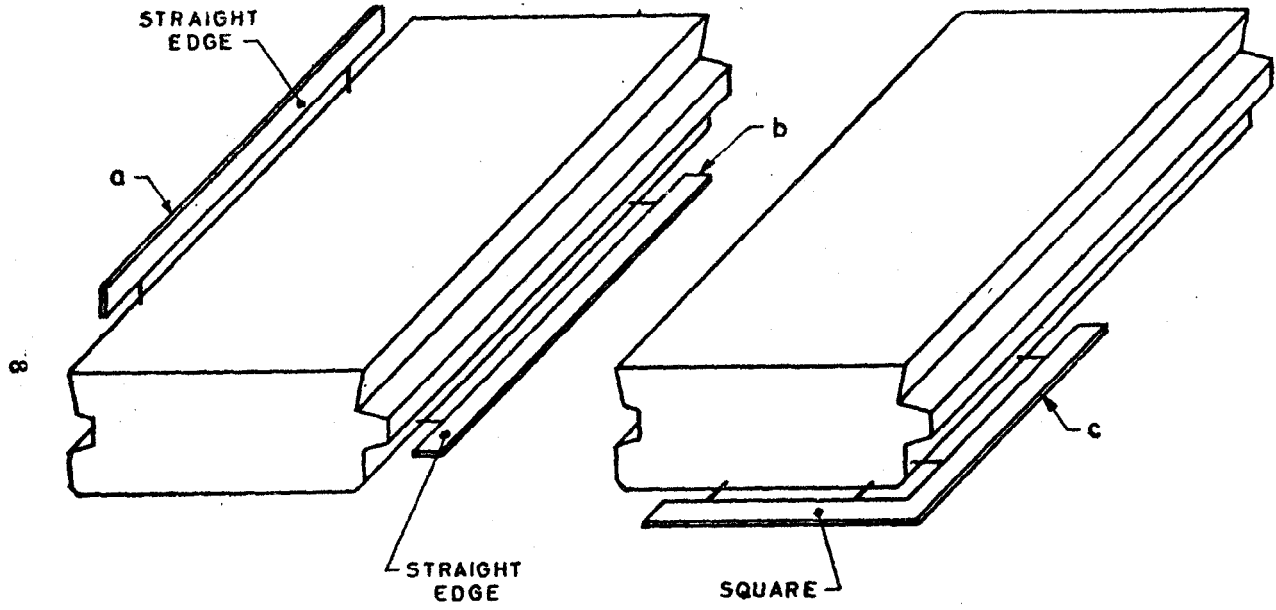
ILLUSTRATING FORM TOLERANCES OF FLOOR AND ROOF SLABS
